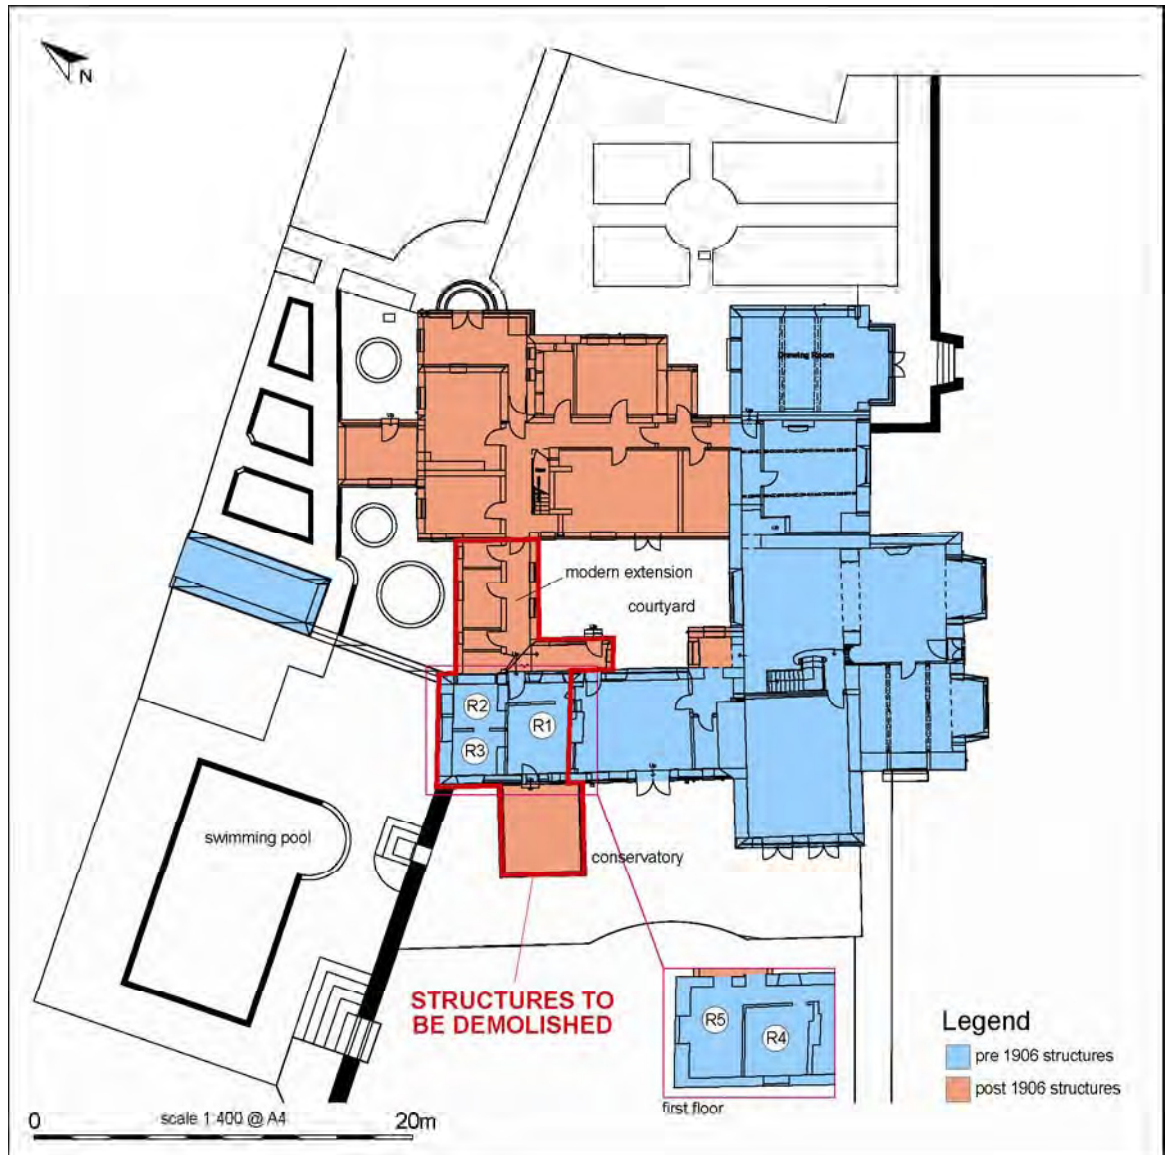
Ground floor plan of Fishleigh House, based on existing architectural drawings.
